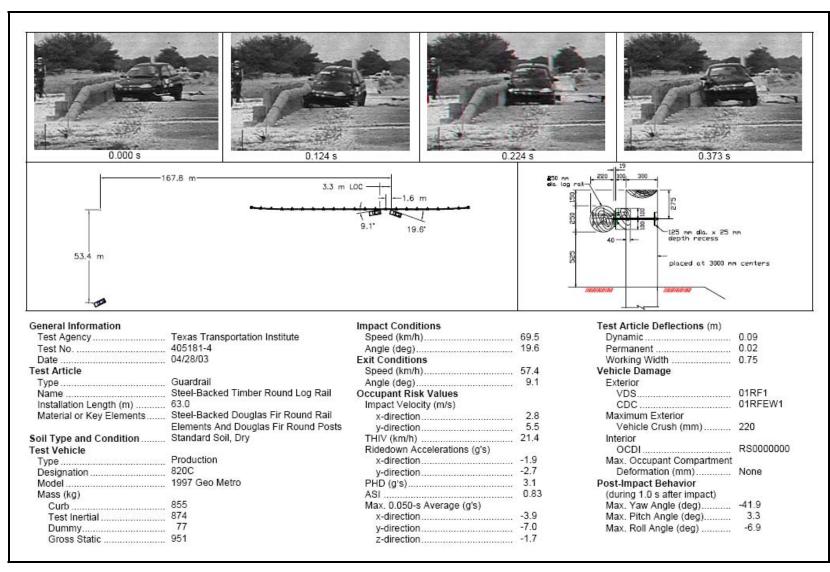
Steel-Backed Timber Round Log Rail Test 2
